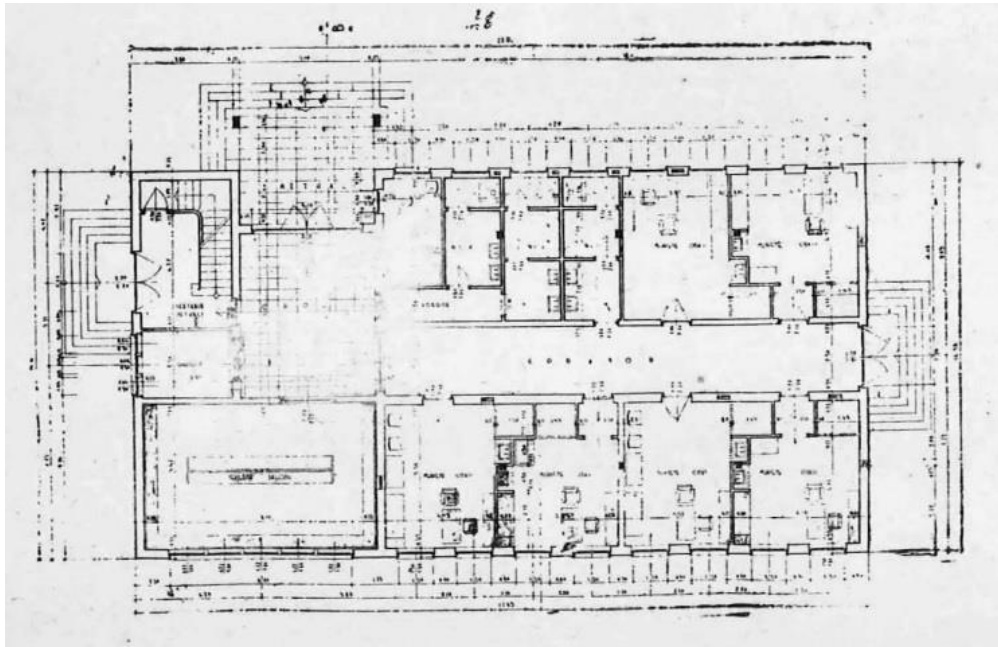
Annex Outpatient Department, Cerrahpaşa Medical Faculty, Ground Floor Plan
